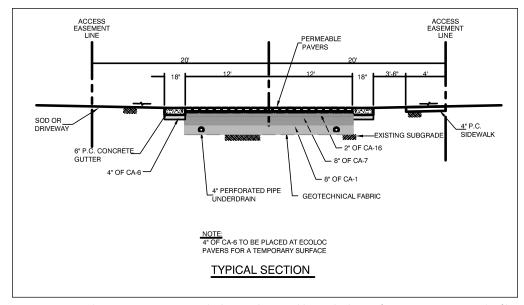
Typical PICP cross section includes a substantial base thickness for water storage and infiltration. The water and sanitary sewer lines run under the street.
